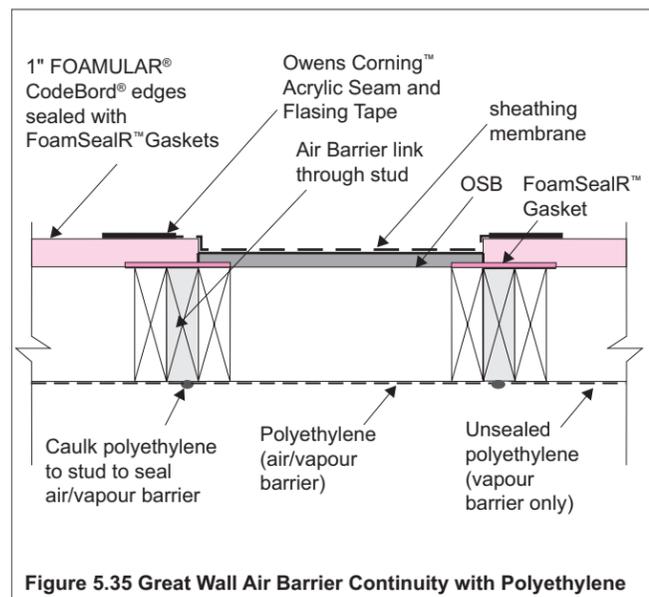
Great Wall Air Barrier Continuity with Polyethylene
